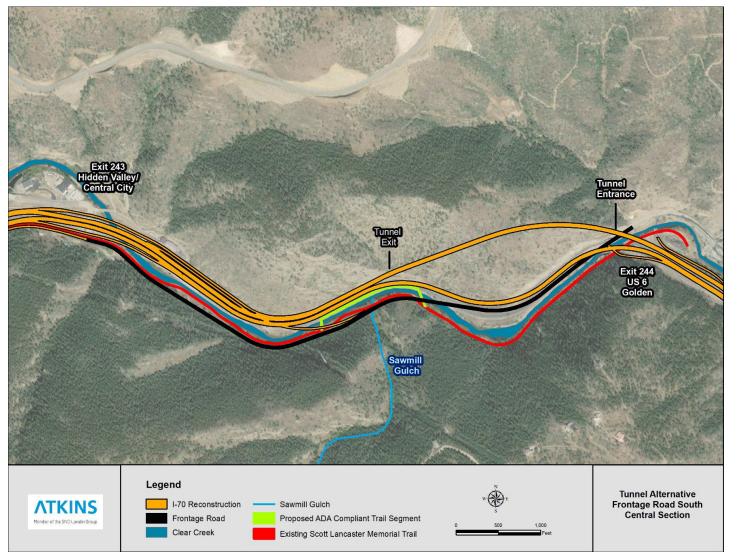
Section 4(f) Resources and Elements of the Tunnel Alternative, South Frontage Road Option, Central Section
